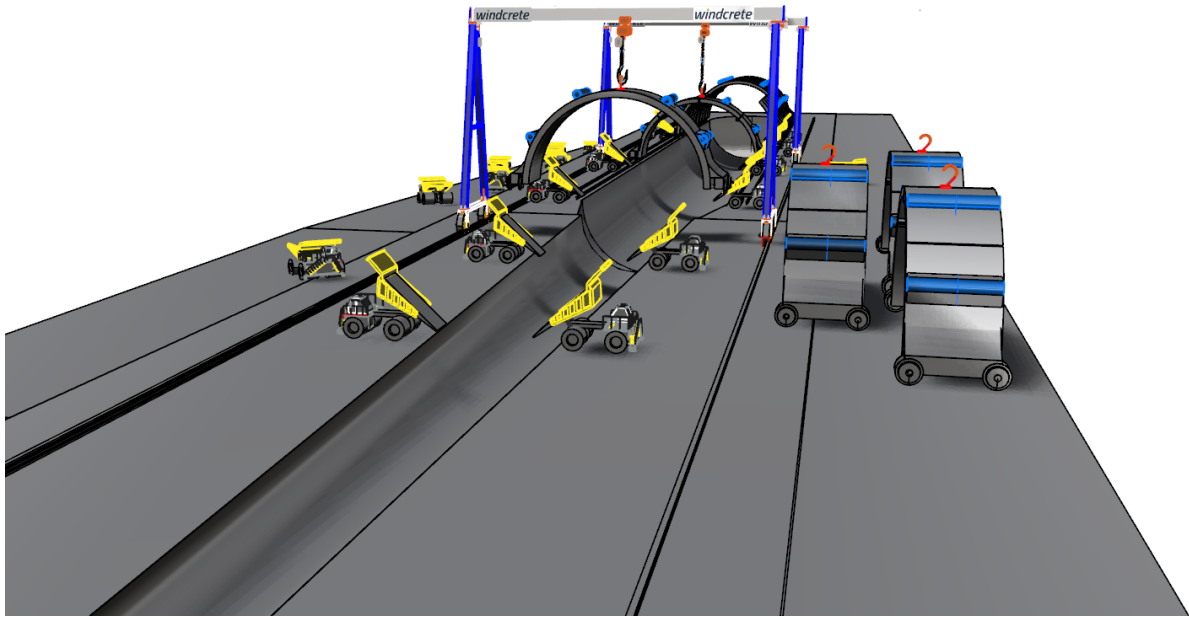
Birdview of fixed-mold facility with 2 gantry crane mounted on rails and dumpsters for concrete placement.
